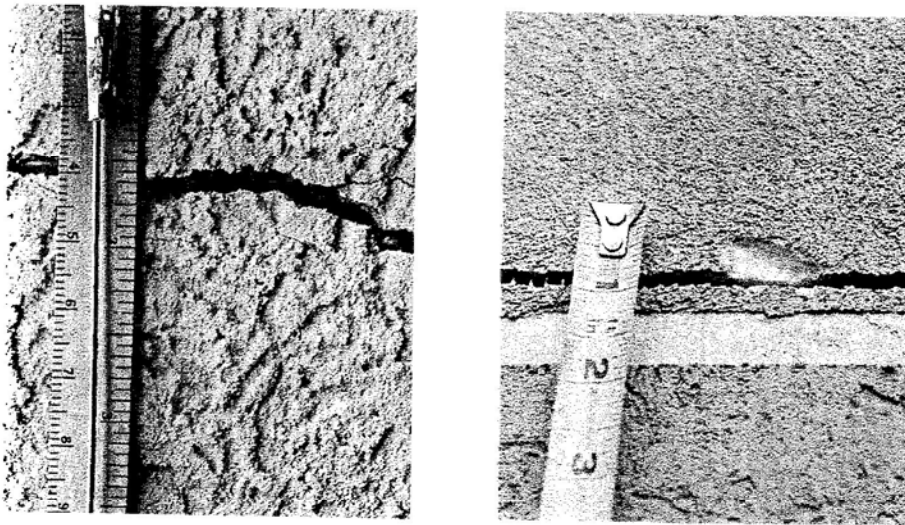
Window corner cracks: Building 4C at left, Building 10 at right. Joint-like feature on Building 10 is deliberately exposed white finish under contrasting top layer.
